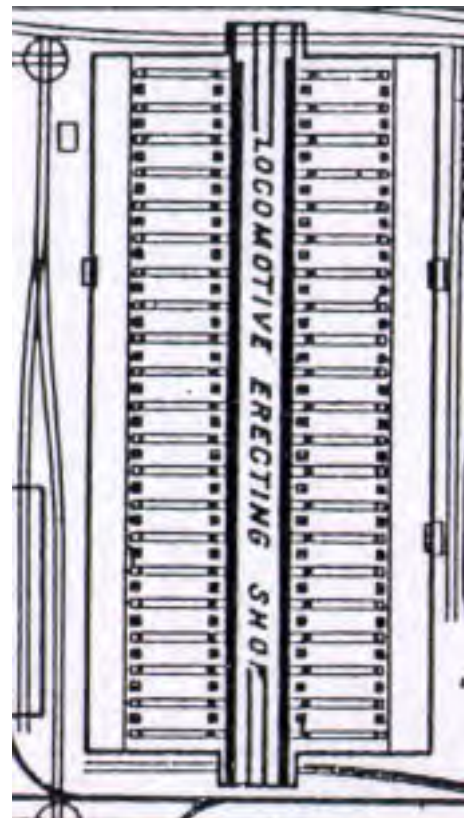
Detail of plan of the Locomotive Erecting Shop at Tegel, Berlin, in about 1914. Note the transversely arranged pits and the central traverser, similar to Eveleigh Carriage Workshops. Source: 'Report on Locomotive Manufactories and Locomotive Repairing Establishments' Fig 12.
